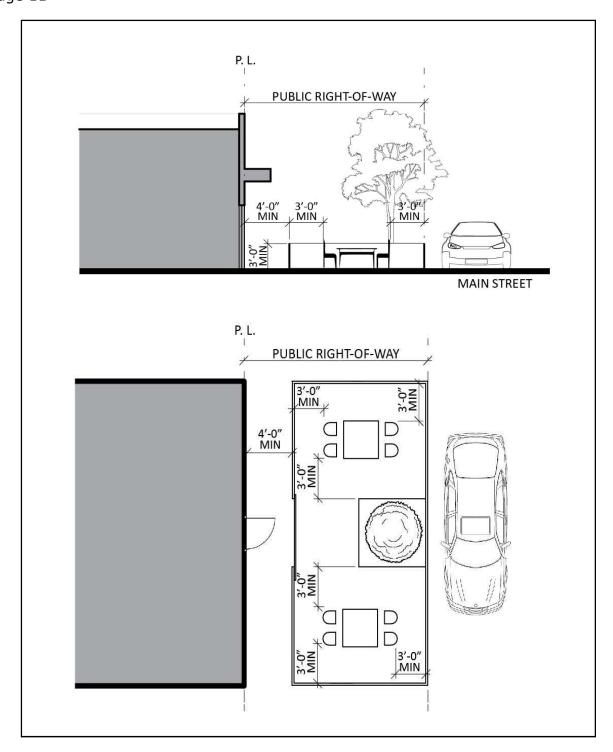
Example of an outdoor dining area in the public right-of-way with a barrier.
